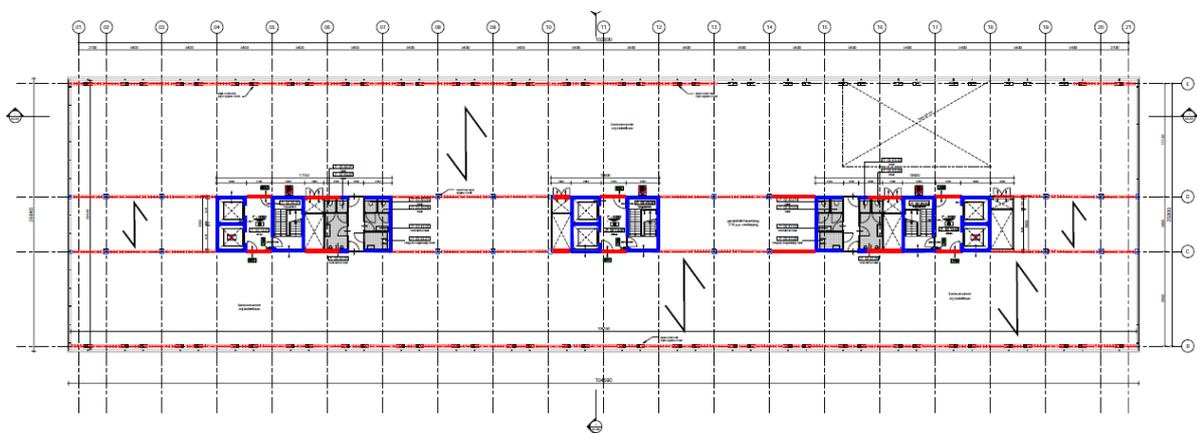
Floor plan of the top floors of The Joan I [40]
